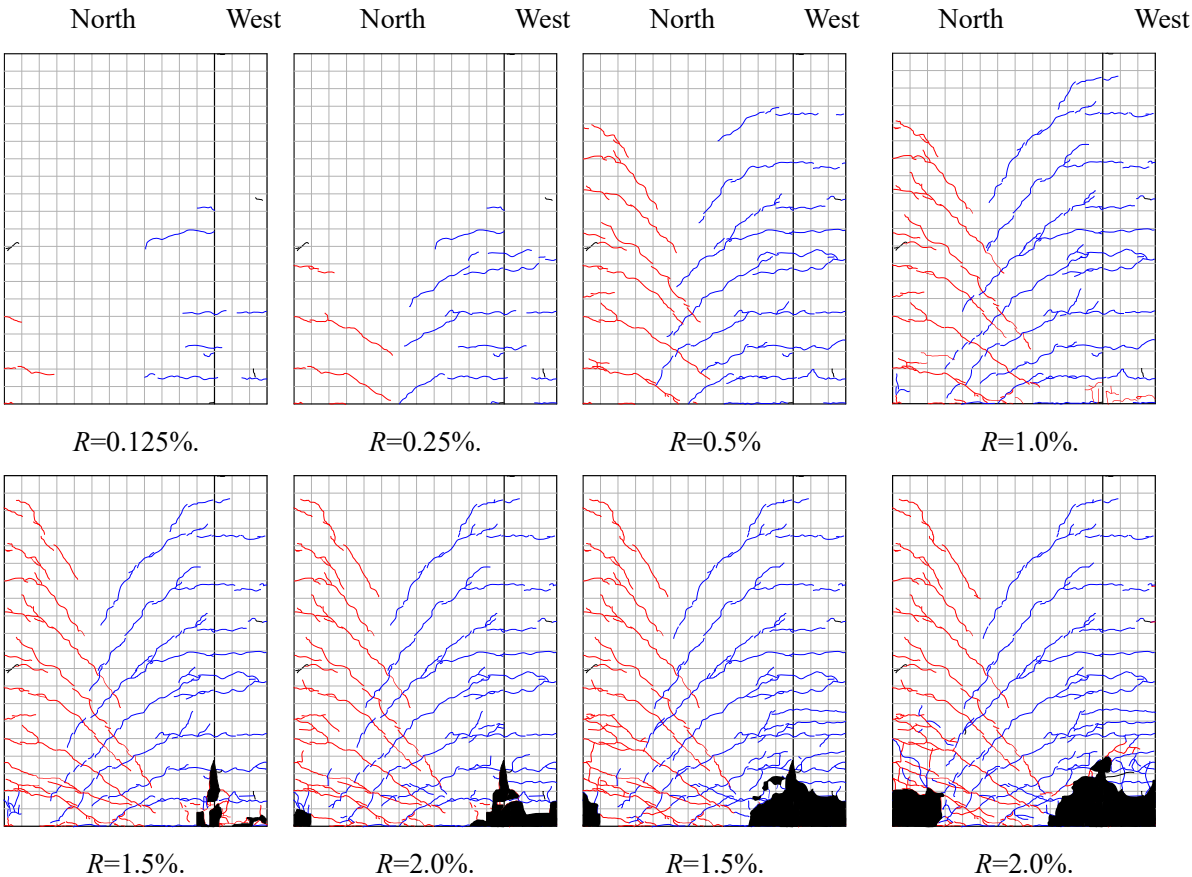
Cracks patterns observed on specimen W20-FD-15
